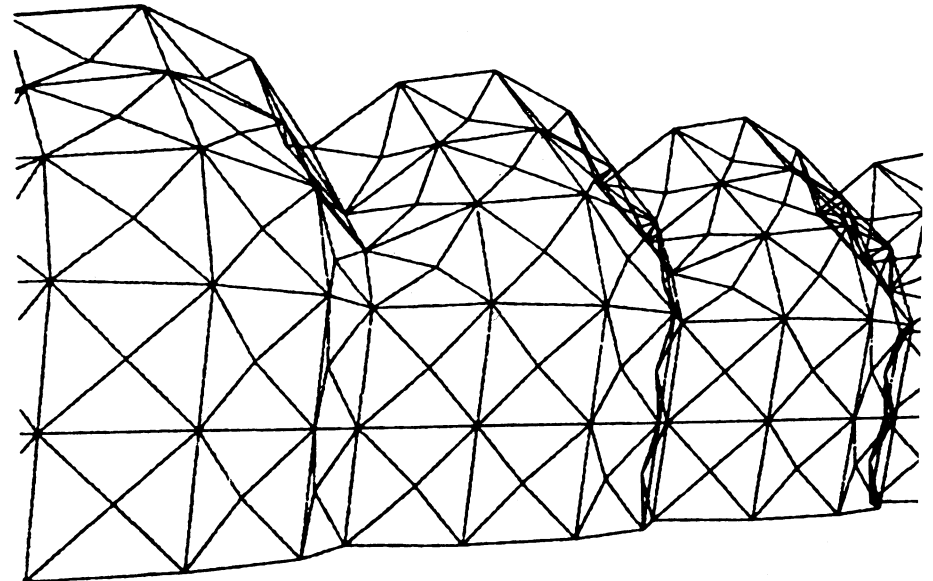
Computer graph of tetrahedral sound damping traffic wall structure. ● Dessin par ordinateur de la structure tétraédrique d'un mur pour l'insonorisation d'autoroutes.
